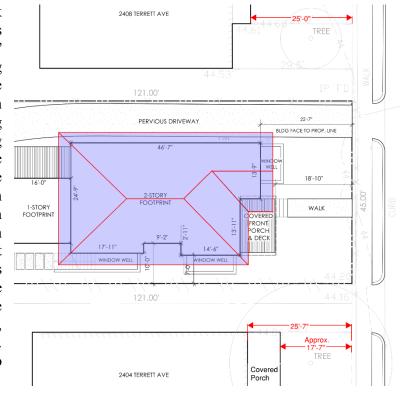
Proposed "L-shape" Building Layout and Alignment with North and South Neighboring Structures
